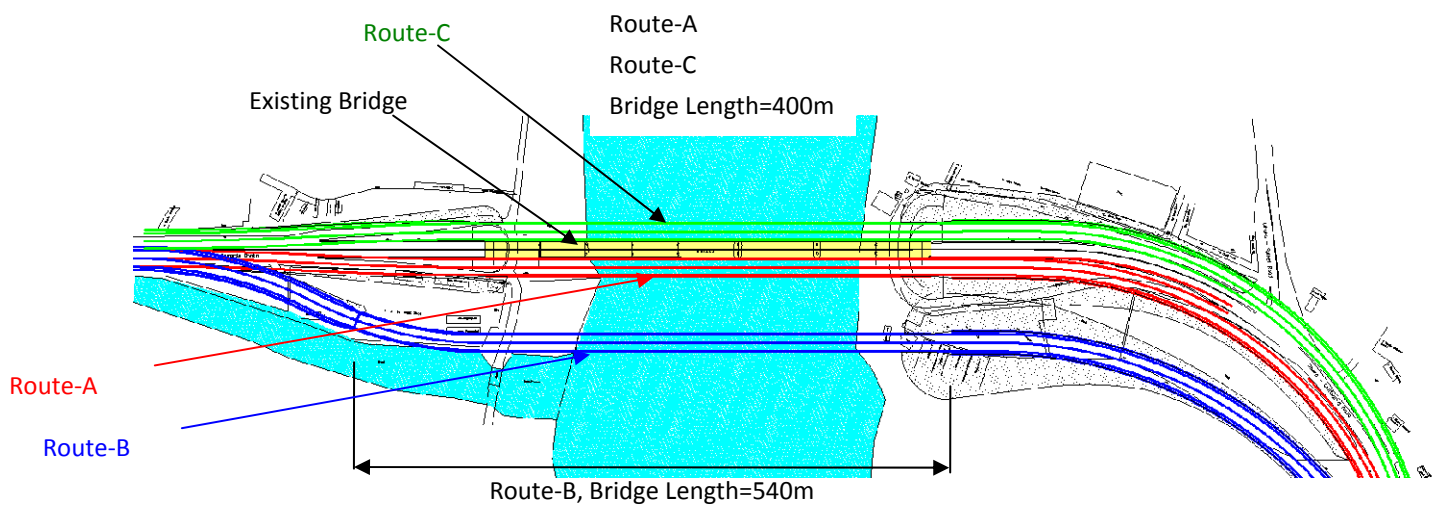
Alternative Routes for Kanchpur Bridge
